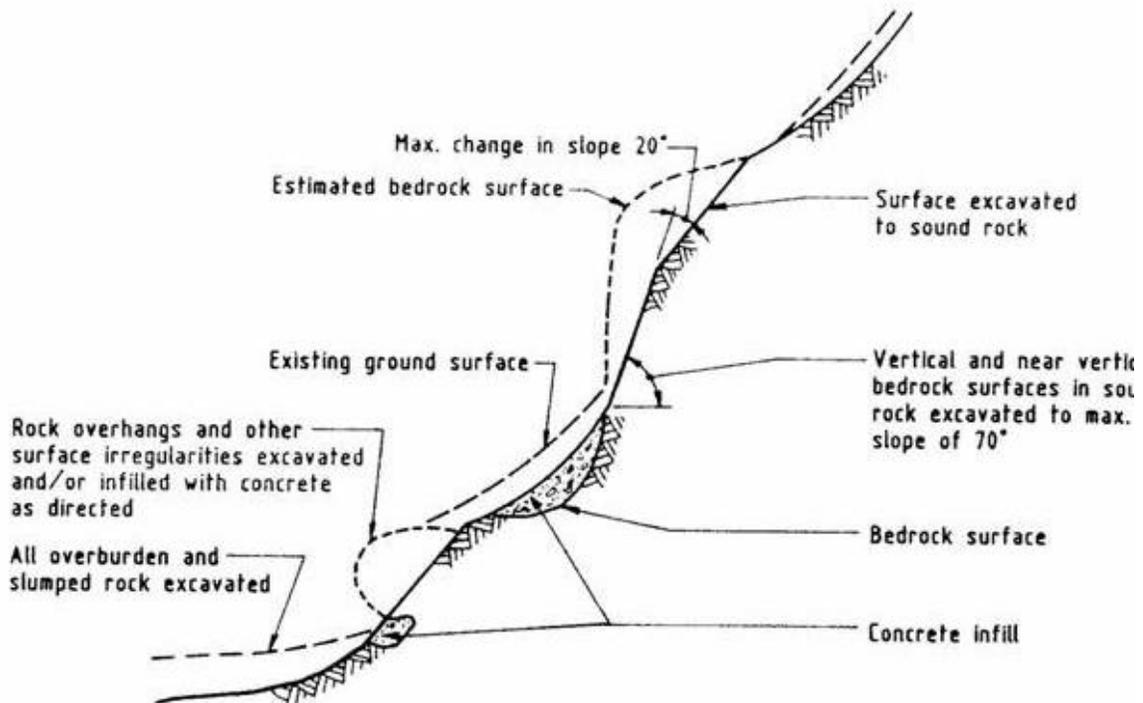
Mica Dam. Foundation excavation, typical excavation detail (Pratt et al., 1972; reproduced in Fell et al., 1992).
